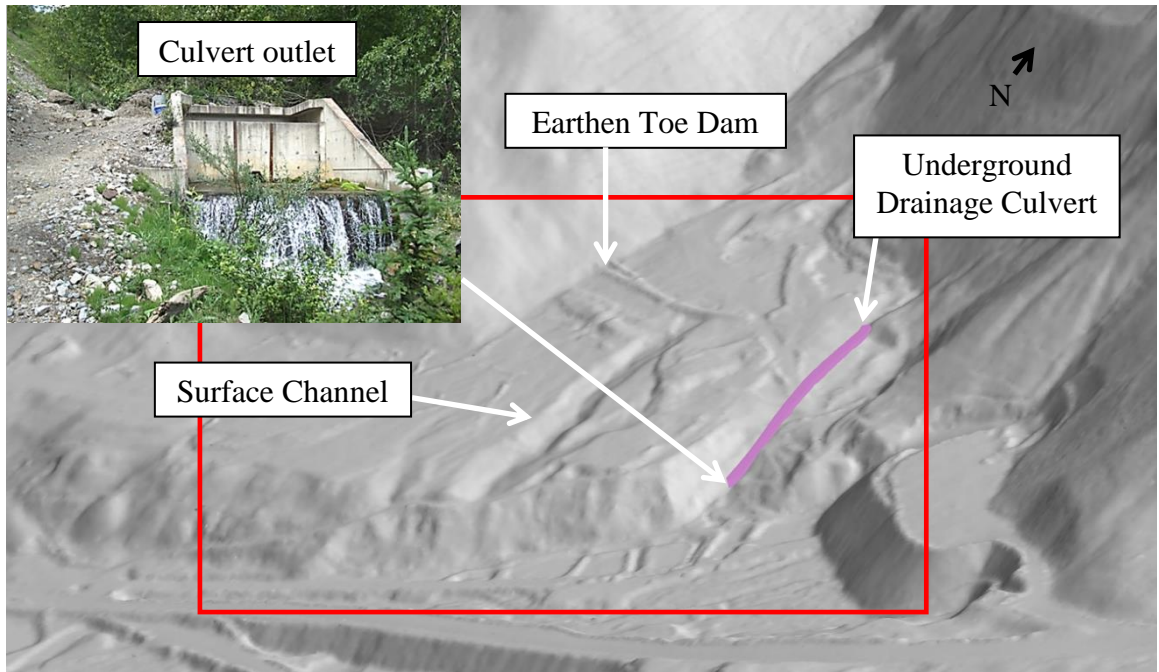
LiDAR data showing the study site in red as well as the surface channel, earthen toe dam, culvert outlet and the underground drainage culvert defined by Worley Parsons Ltd. (2012).
